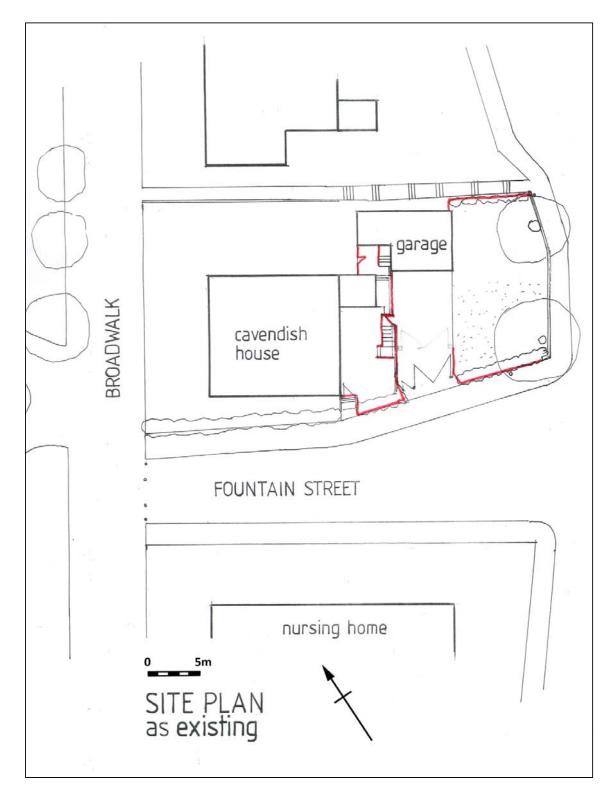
Cavendish House, 11 Broadwalk showing proposed new railings (in red) and the current ground layout of the property. Based upon architect's plans.
